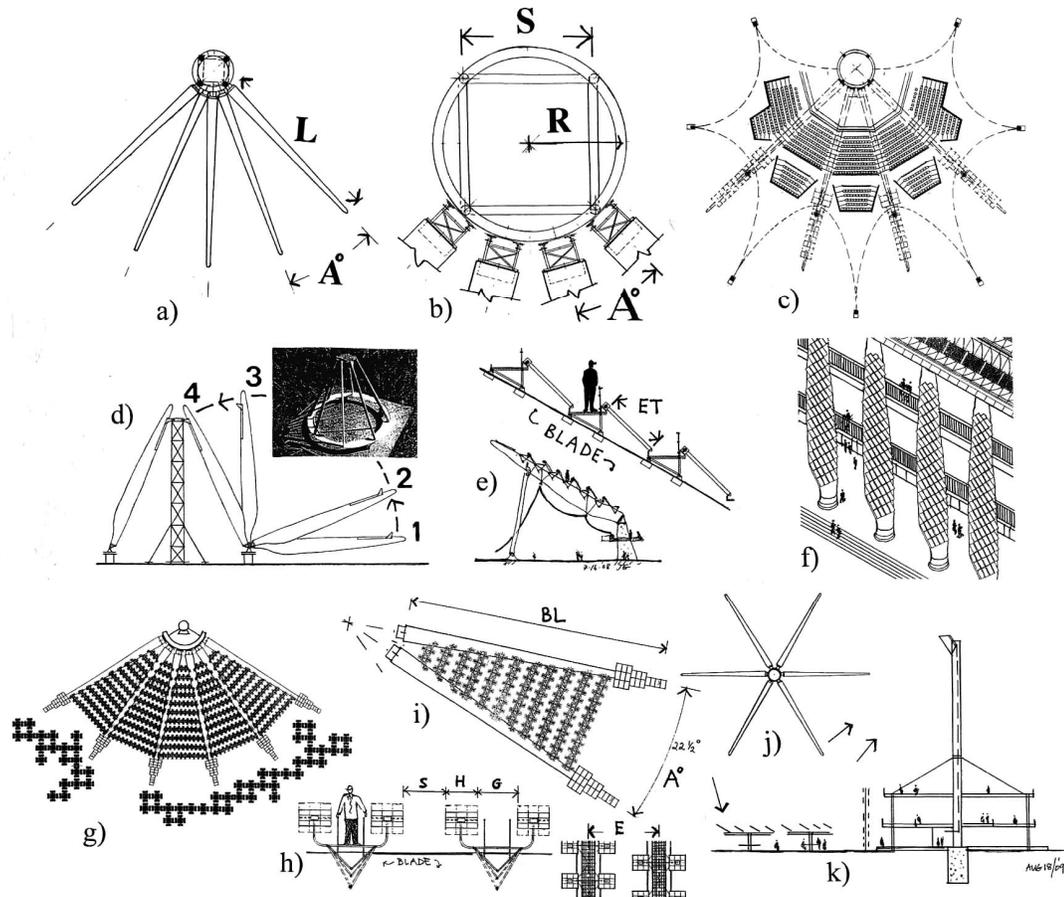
Architectonic used blade configurations: a-c) Open air theatre with tensioned tent roof hanging from four radiating blade beams; d) teepee type frame; e) blade beams supporting; f) blade colonnade with PV; g-i) receiver on tower and small heliostats; j-k) restaurant on a tower-receiver with horizontal radiating blade beams.
